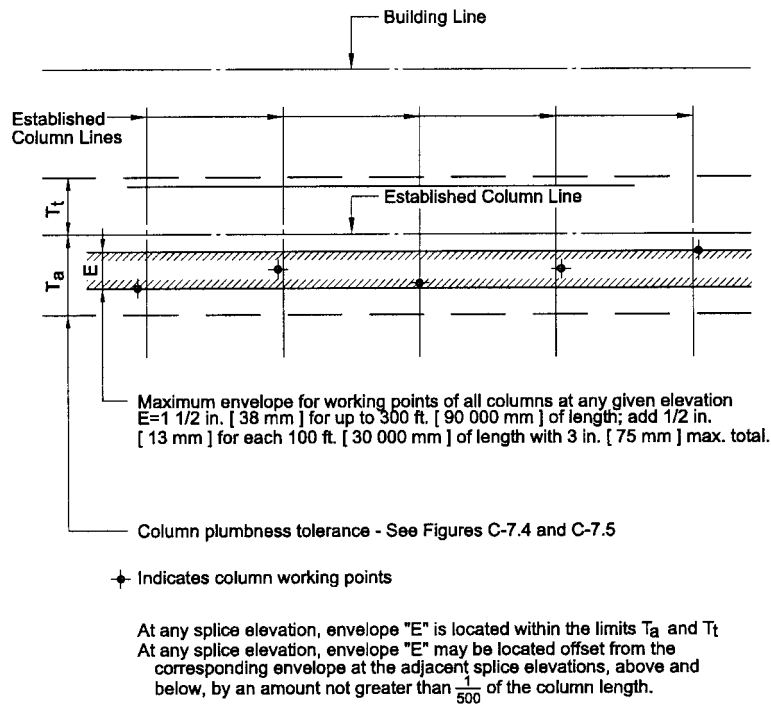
Tolerances in plan at any splice elevation of exterior columns.
